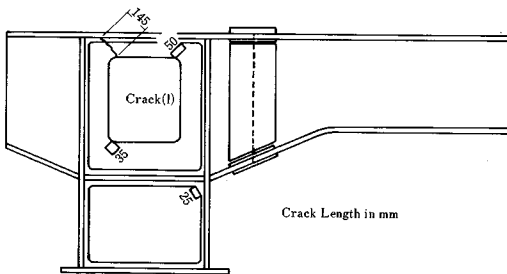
Fatigue Cracks on Diaphragm of Test Model TP 2 R.
